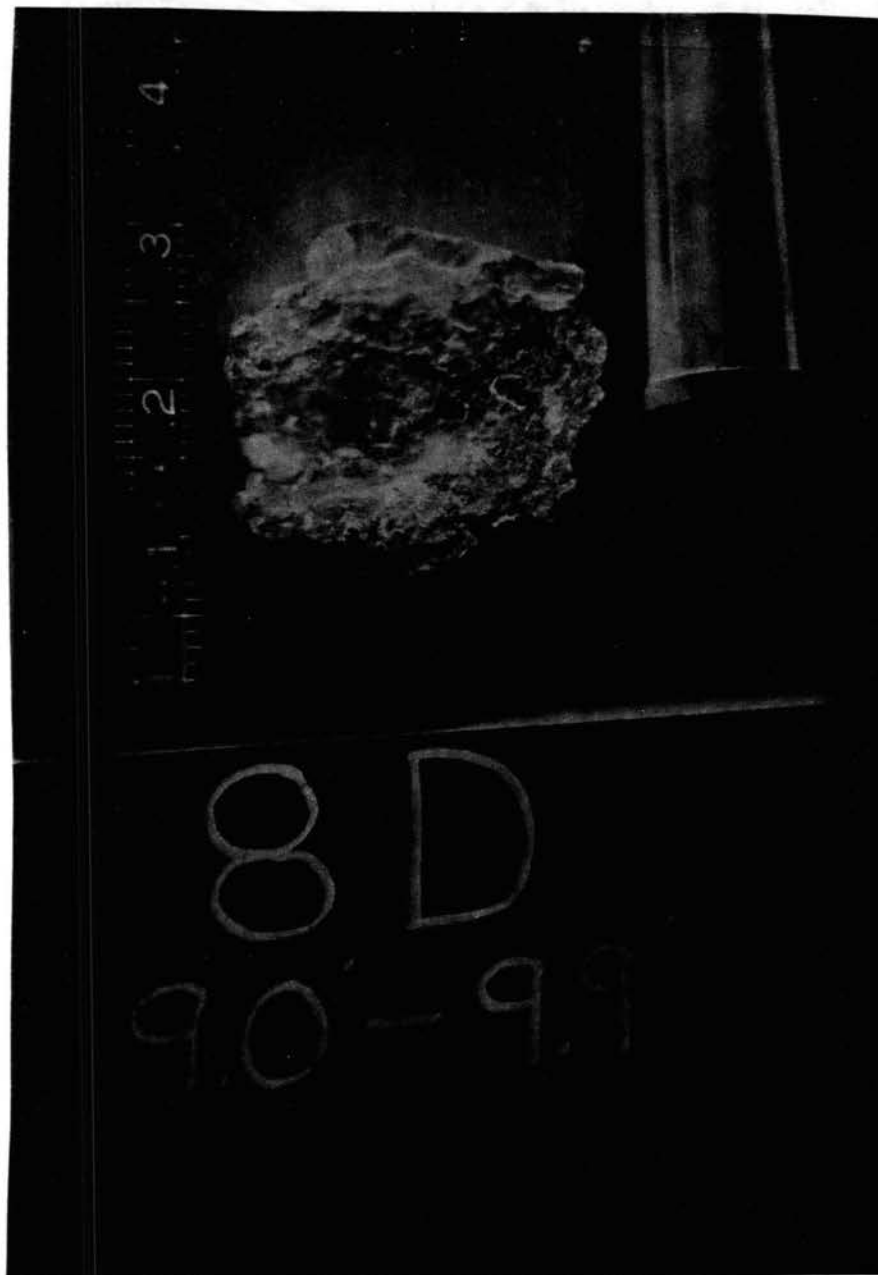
Secondary Clay Structure, Slickenside, Sample 8D at Boring W4, Wagoner Site
